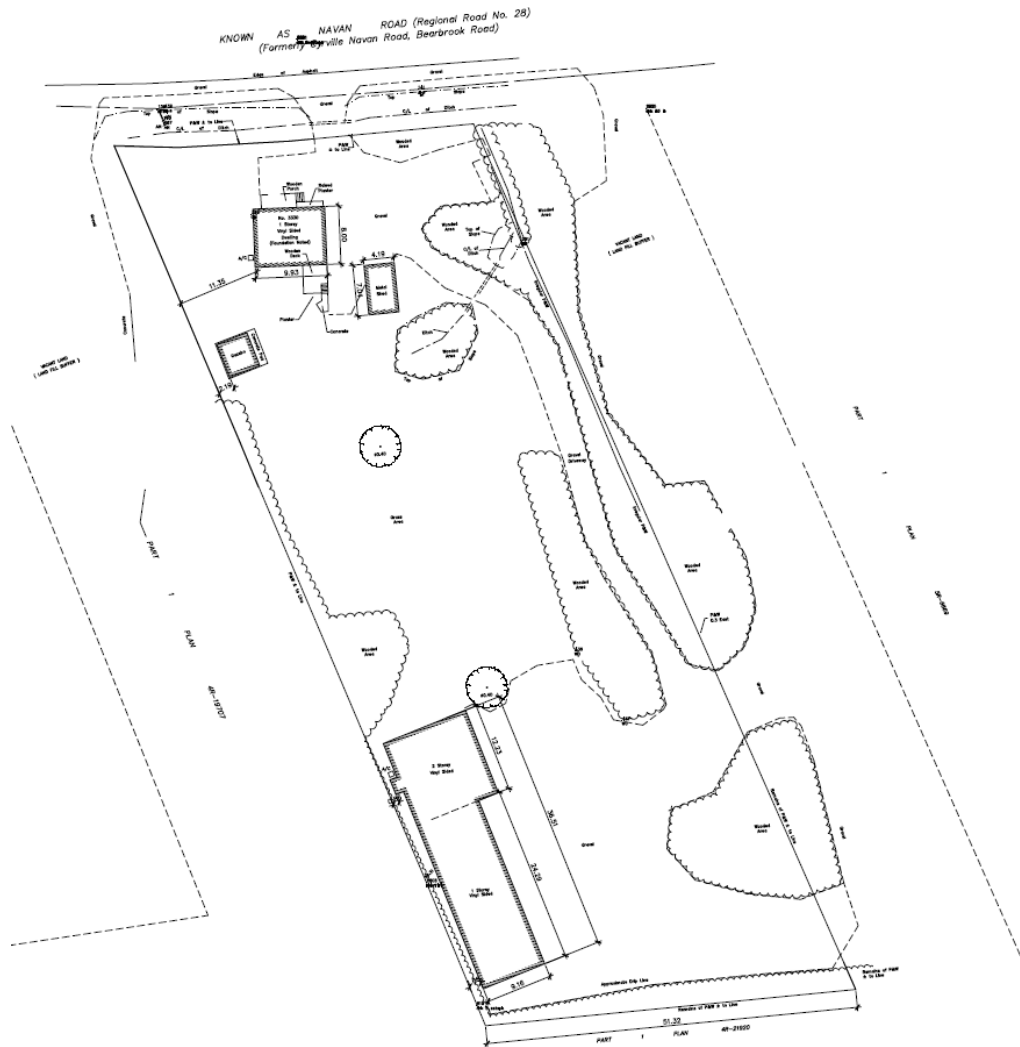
Site Development Plan (including the new building, and existing detached dwelling and accessory structures)
